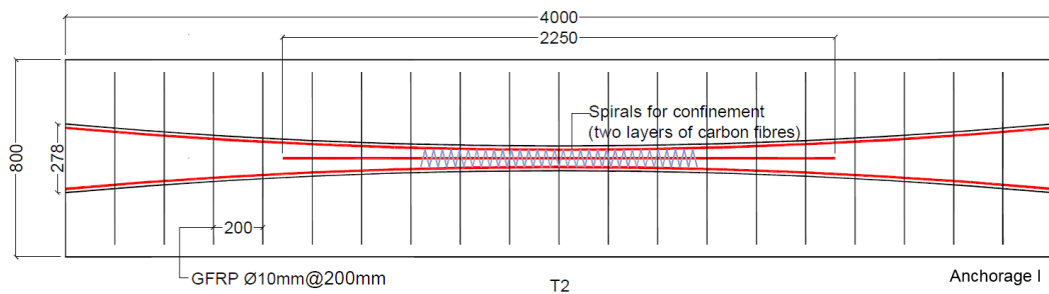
Arrangement of anchorage and distributed bars in flange of group T2
